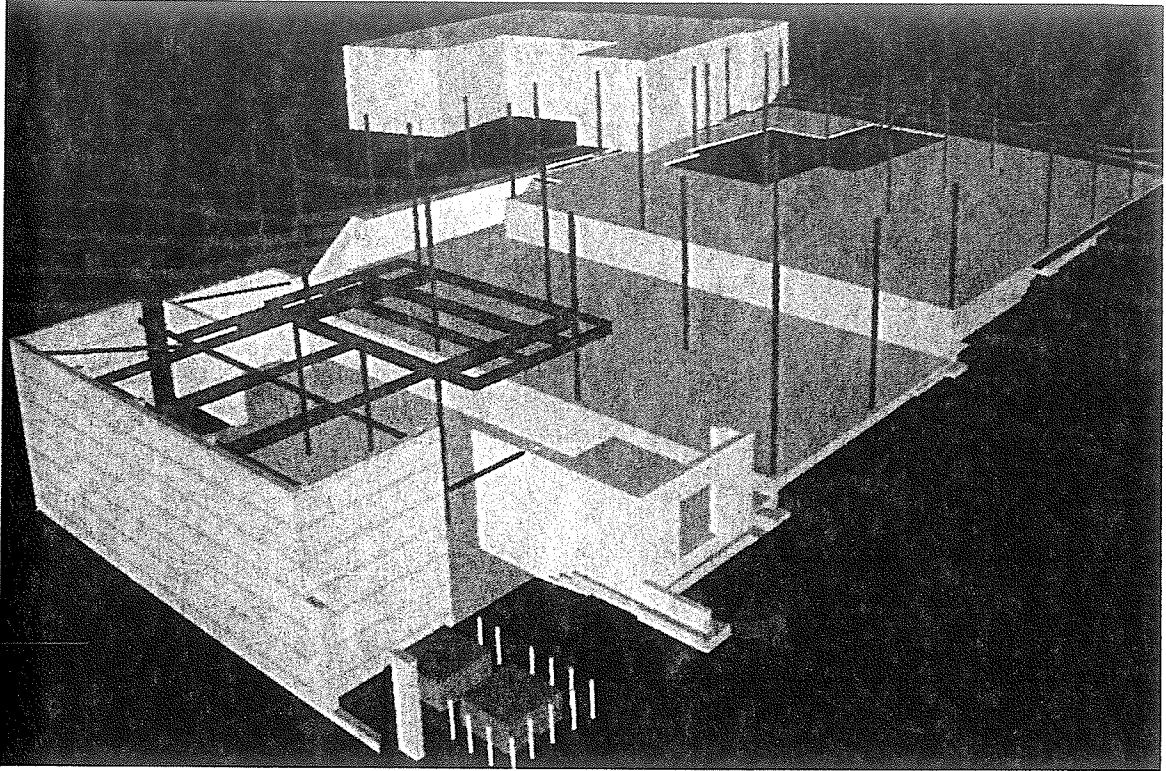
Nov 1994 Central Utilities Plant construction reaches installation of structural steel. All footings, concrete slabs, and masonry walls are in place.
